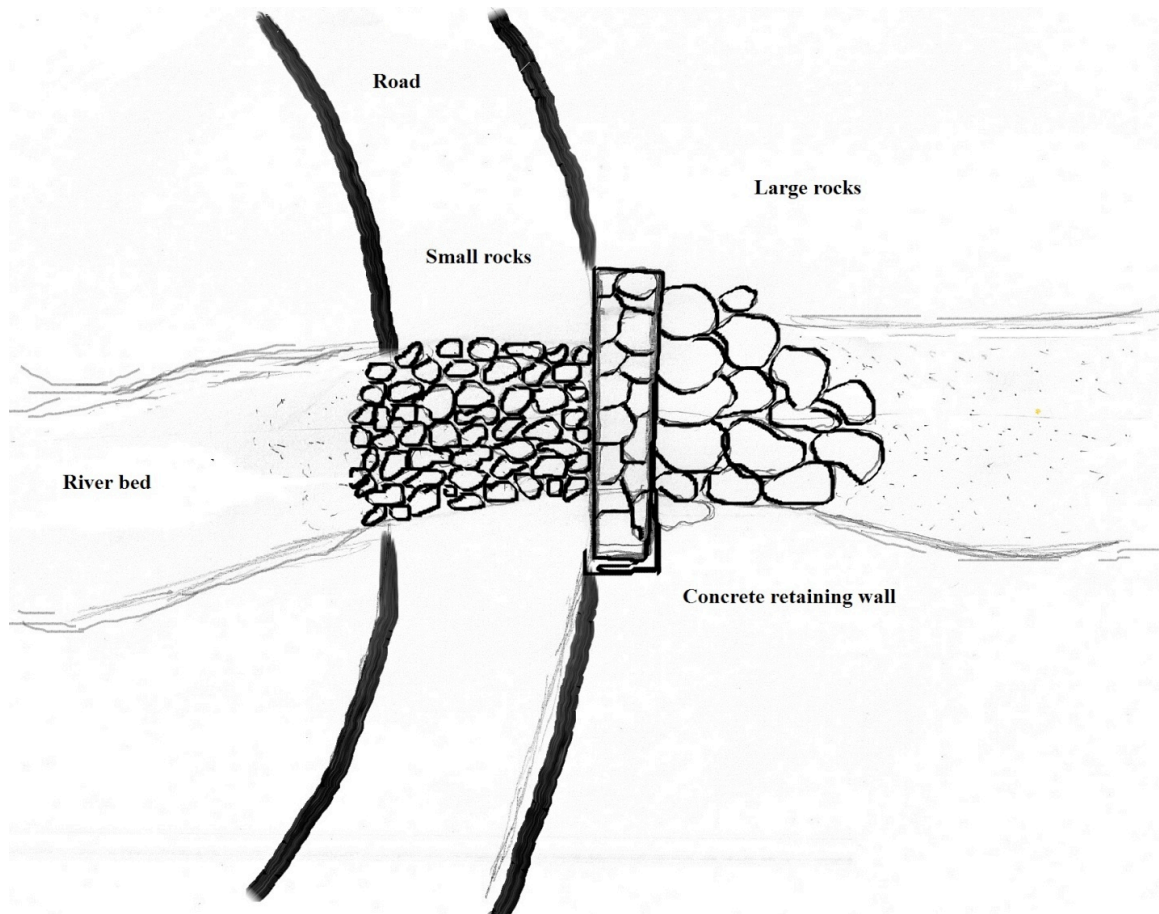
Illustration for the positioning of the retaining wall in small to medium sized drainage lines.
